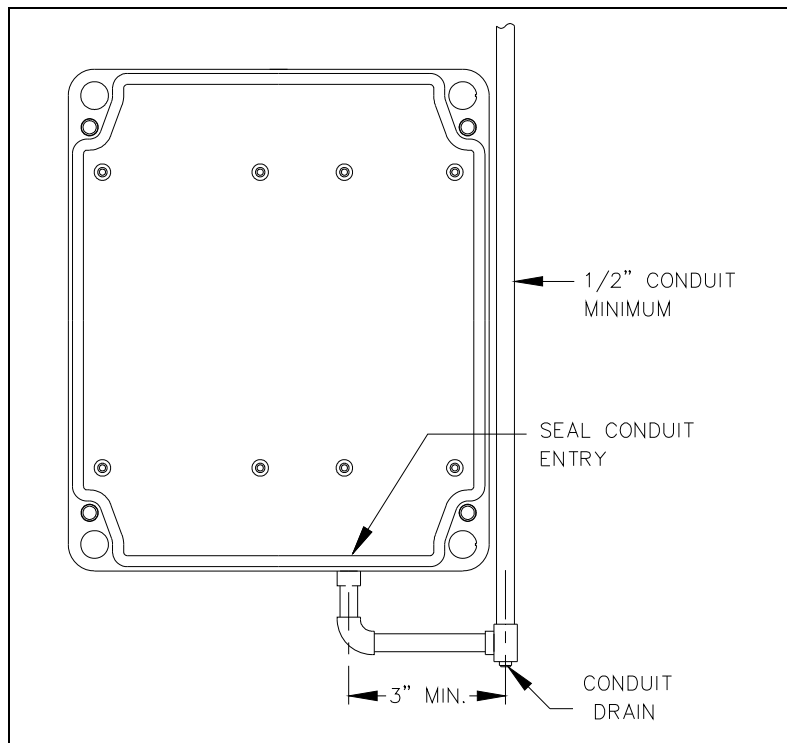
Bottom entry conduit installation details (RECOMMENDED for non-metallic enclosures)
